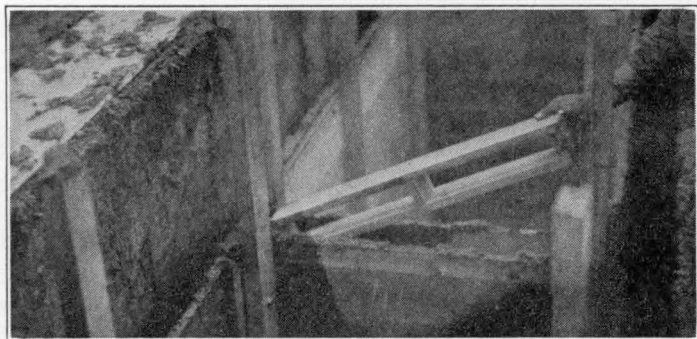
CORE FRAME BEING DROPPED TO HORIZONTAL
